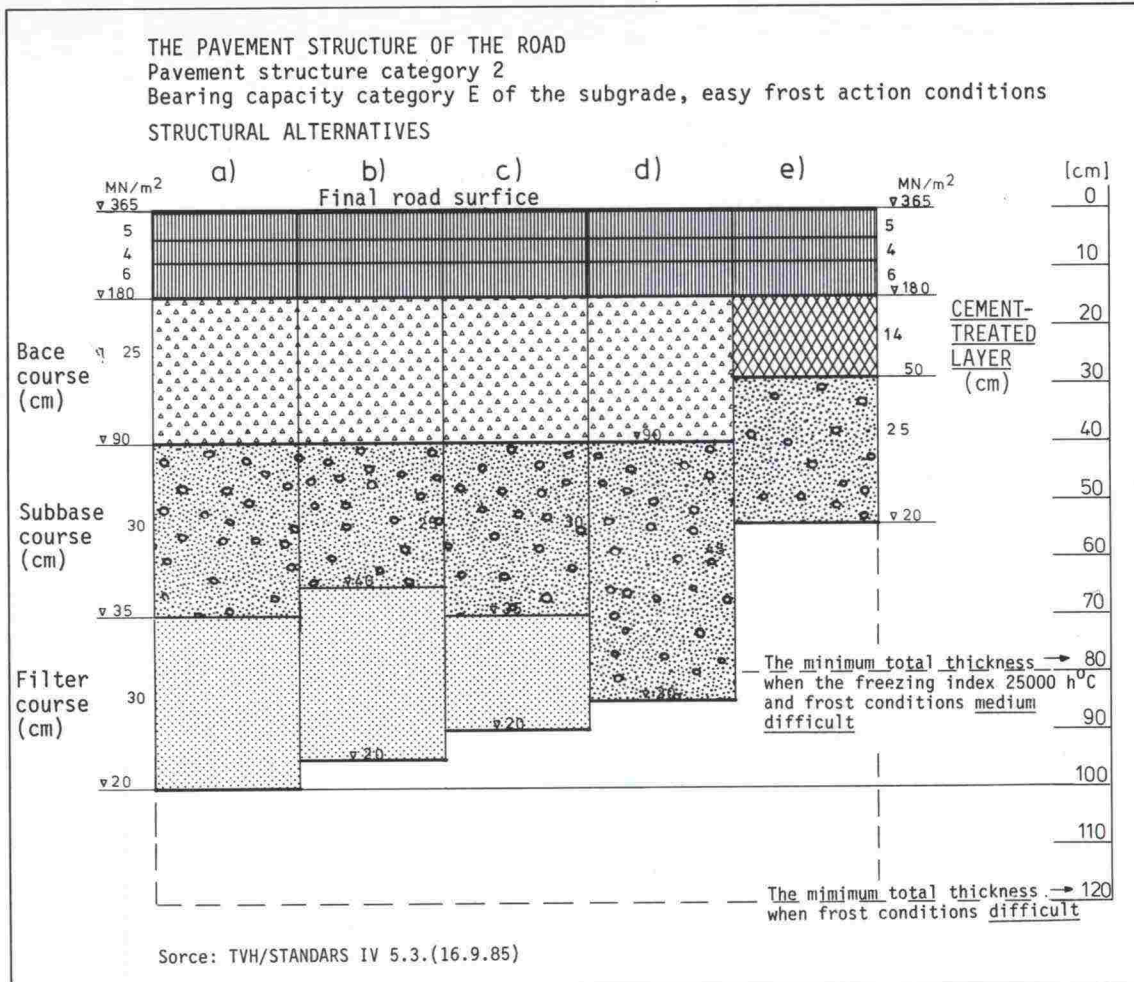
Alternative pavement structures, the example from the instructions of the Road and Waterways Administration
